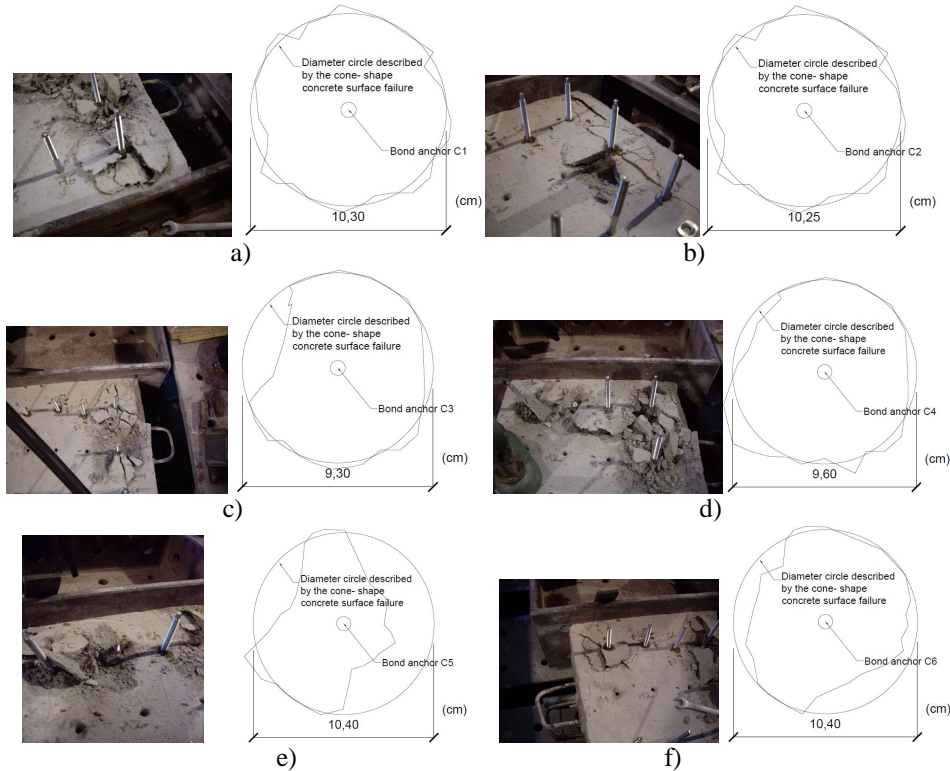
Failure modes of bonded anchors: a) C1 to f) C6 and specimen failure, with a schematic representation of the concrete cone failure inscribed in a circle.
